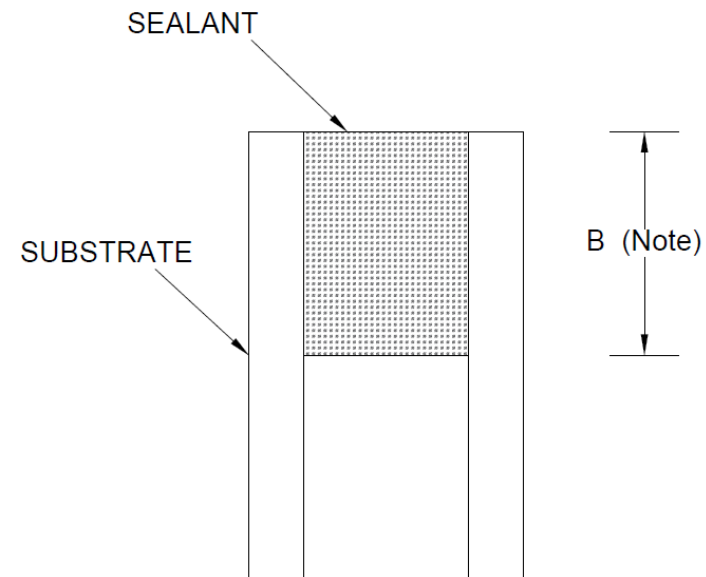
SIDE VIEW OF TEST SPECIMEN WITH SPACER REMOVED
